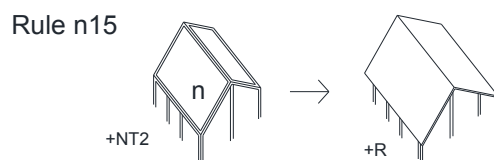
Rule for definition of saddle slope roof on Nefar type 2.
